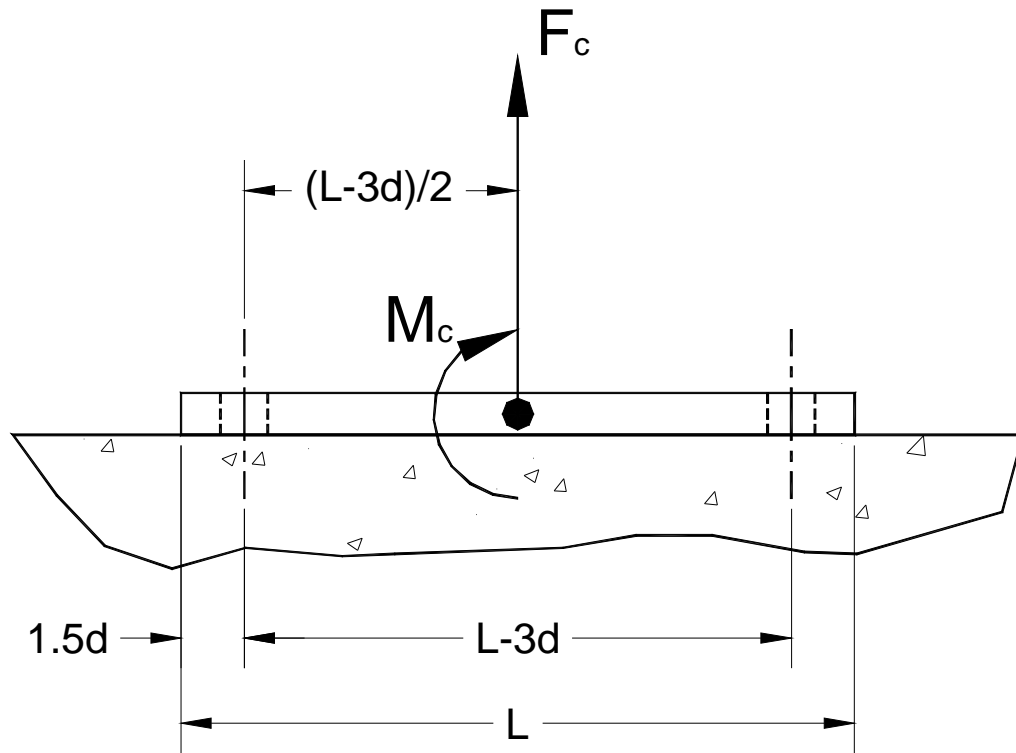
Assumed Base Plate Loading Arrangement for Case 3.
